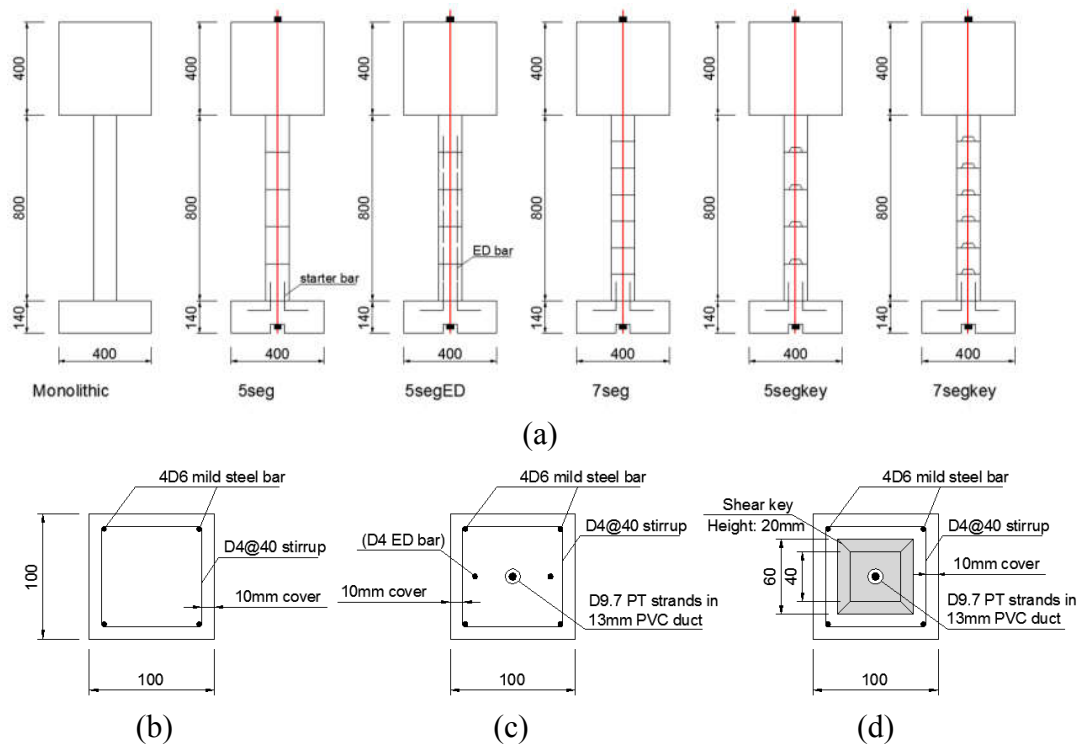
(a). Specimen schematic drawing, (b). Section of monolithic, (c). Section of 5seg, 5segED and 7seg, (d). Section of 5segkey and 7segkey.
